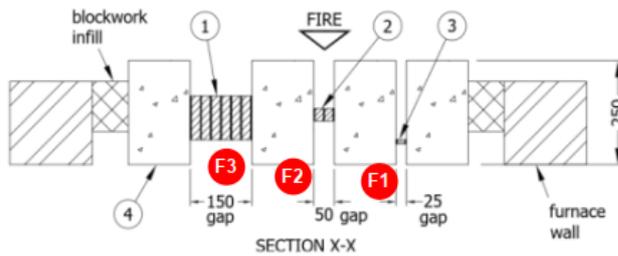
Cross-section of wall linear gap systems F1-F3 – assessment 1 (as shown in WF 148052) – dimensions in mm
